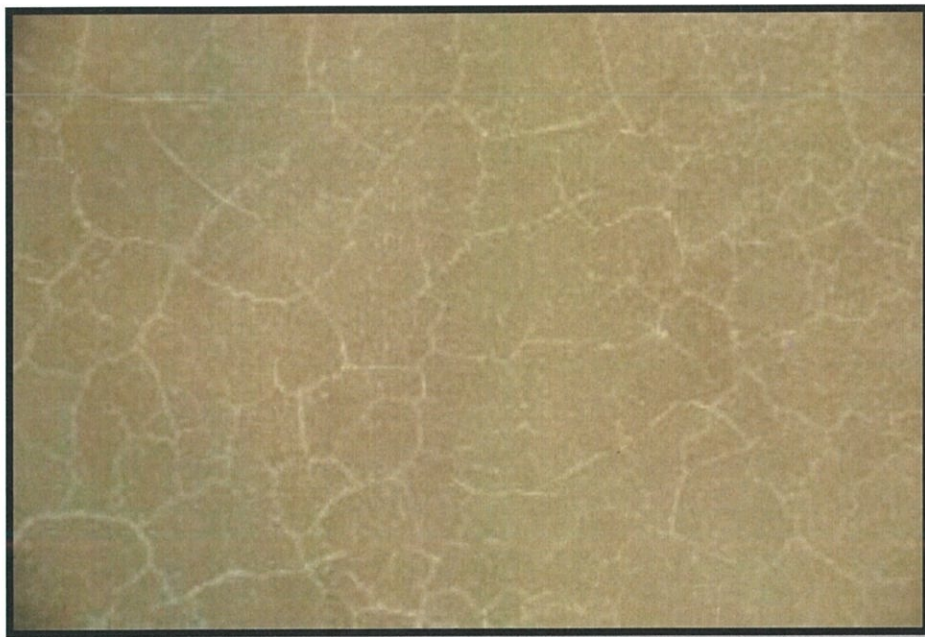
Crazeing Crack. (Source: Hijauan Damai Sdn. Bhd.)
